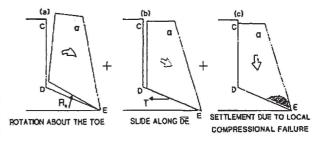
Schematic diagrams showing three typical failure modes observed in the right-hand wall of Chiba No. 2 embankment.
